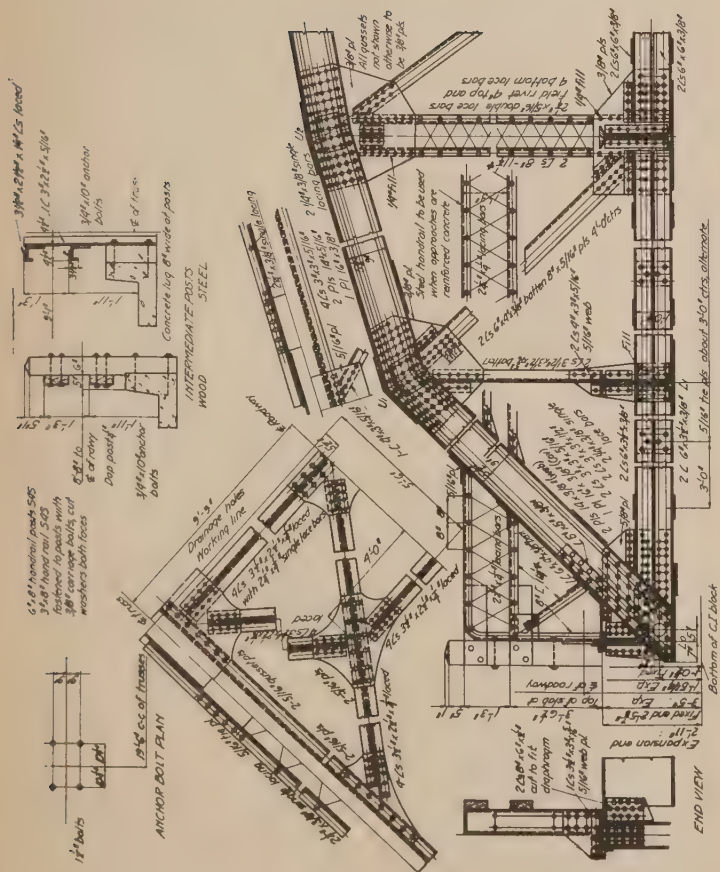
Longitudinal section, typical 200-foot riveted truss.
